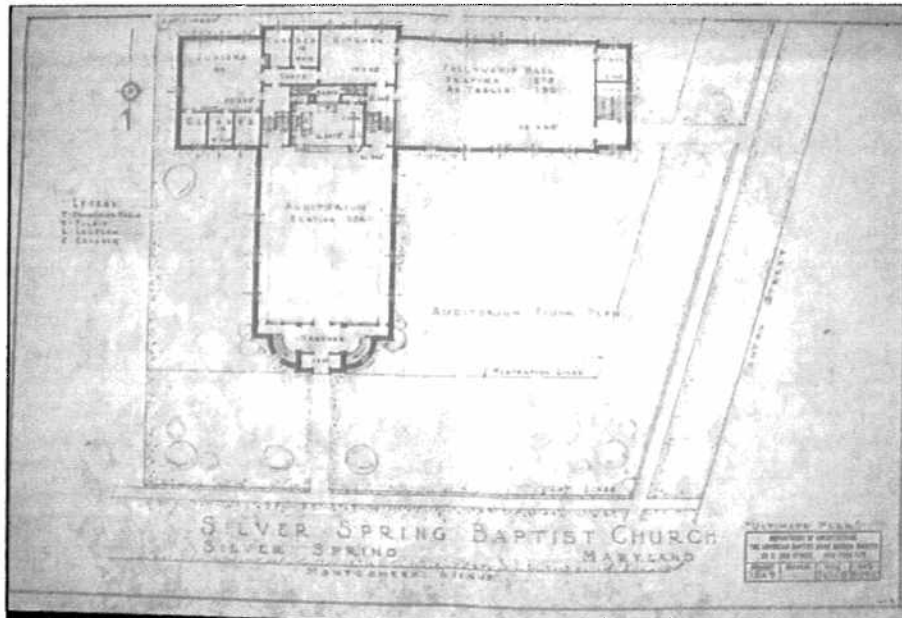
1930 American Baptist Home Mission Society proposed new church plan. Drawing No. 1.
